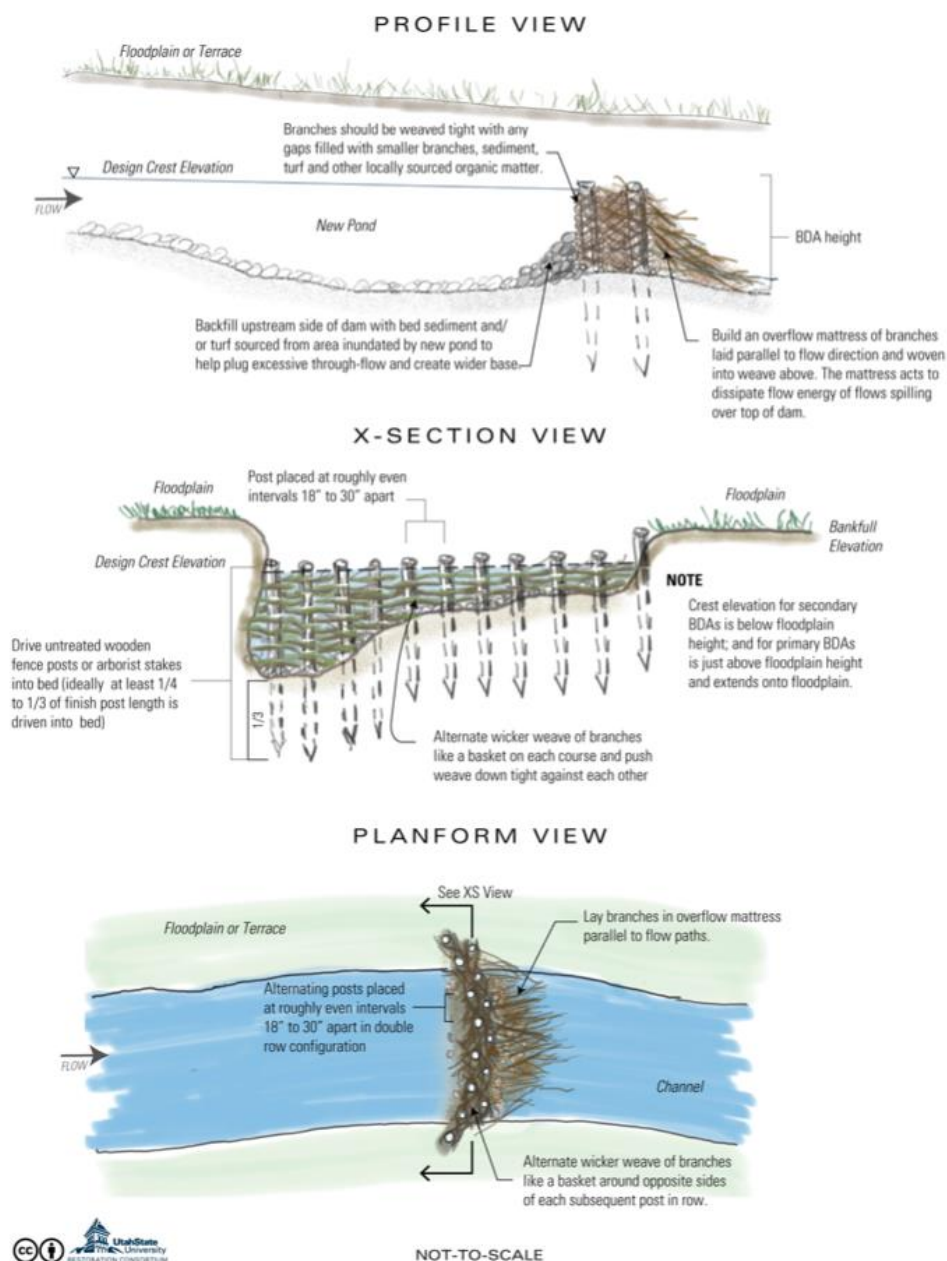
Typical drawing sketches of a beaver dam analogue intended to cause ponding, overbank flow, and aggradation.
